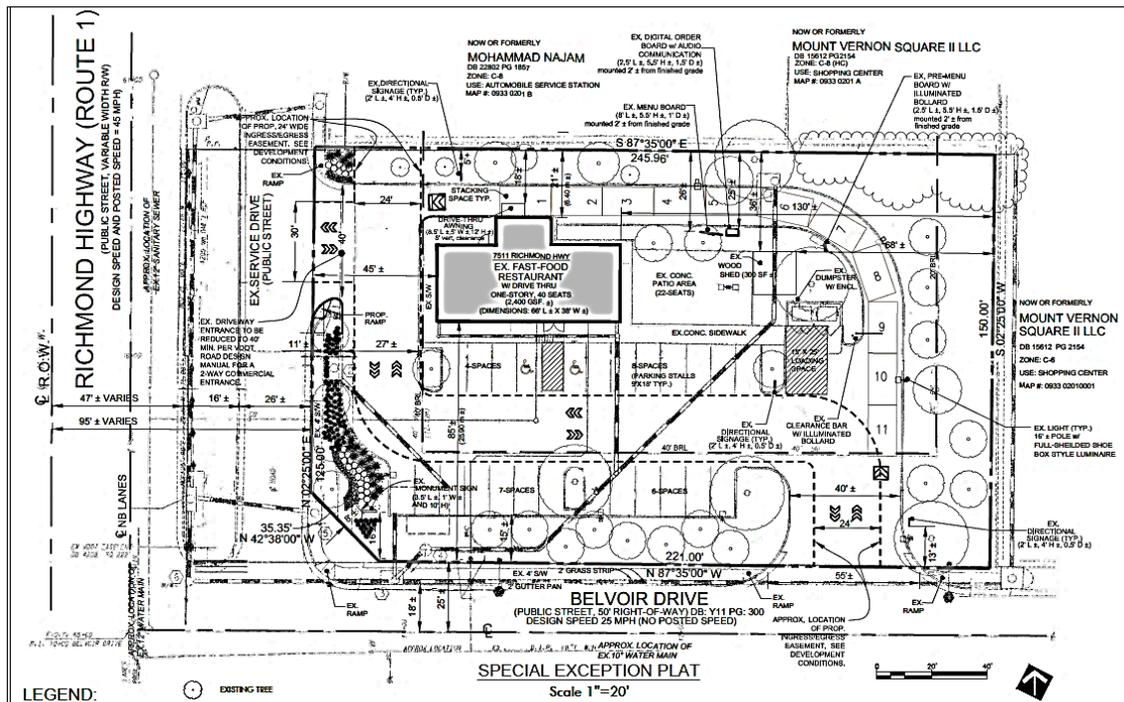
Site Layout, Source: SE Plat, Sheet C-2.00
